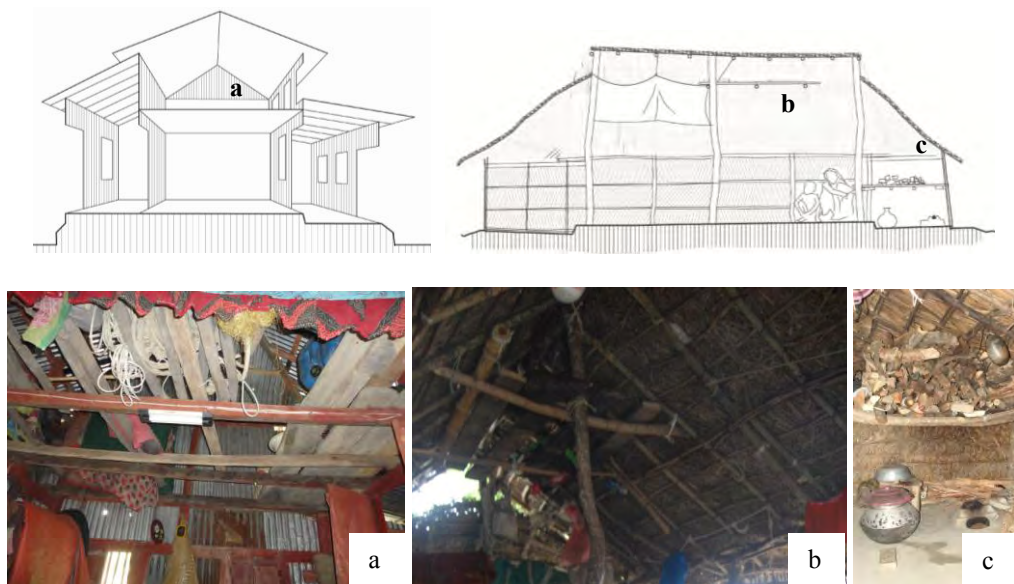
Ceiling mounted storage space is a common feature of traditional house in coastal village
